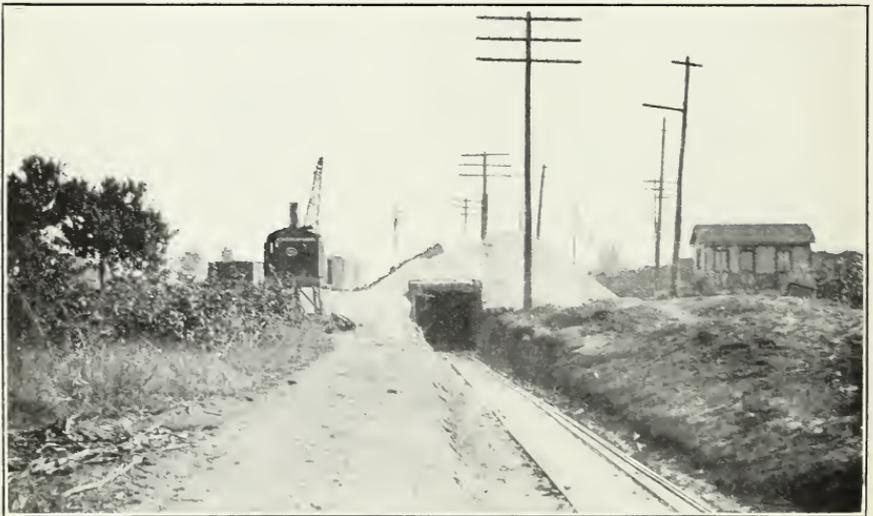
LOADING TUNNEL FOR BATCH BOXES.
